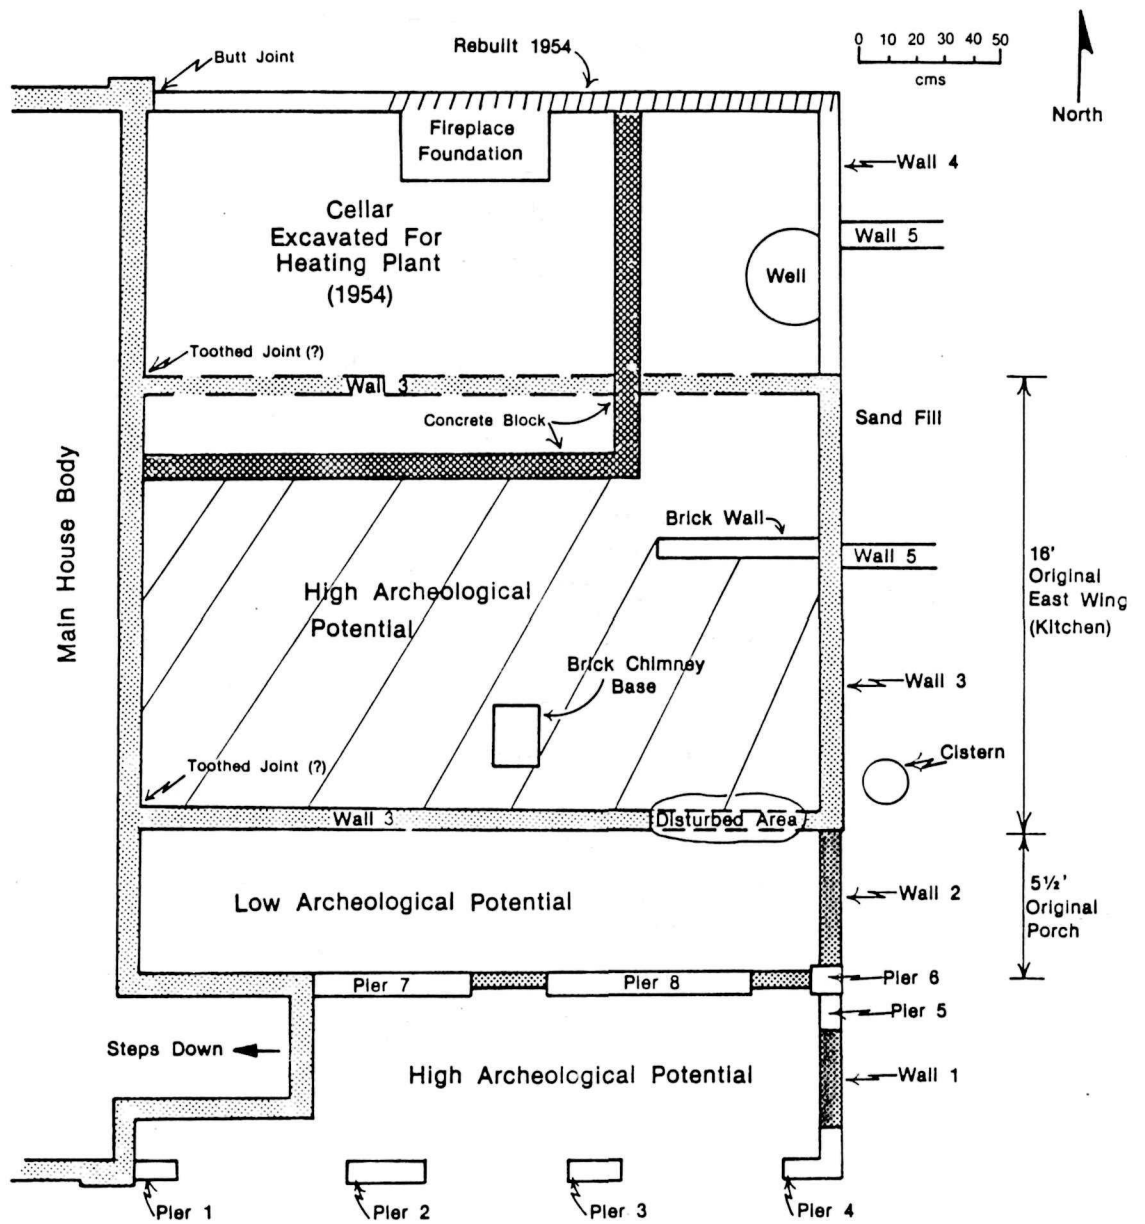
Lincoln Home Back Extension (East Wing); Structural Relationship of Various Walls and Piers.
